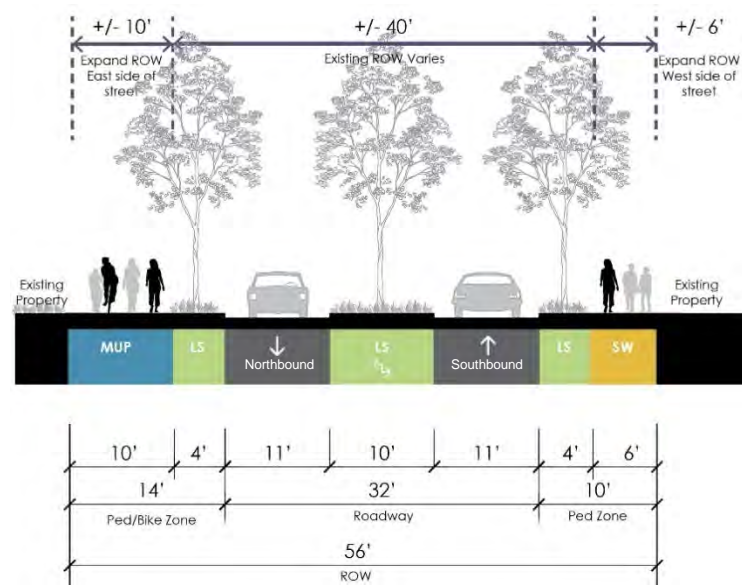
'Front Door' Entry—Road and Hartford Road Realignment (View Looking South Between 22nd Street NE to 20th Street NE)
